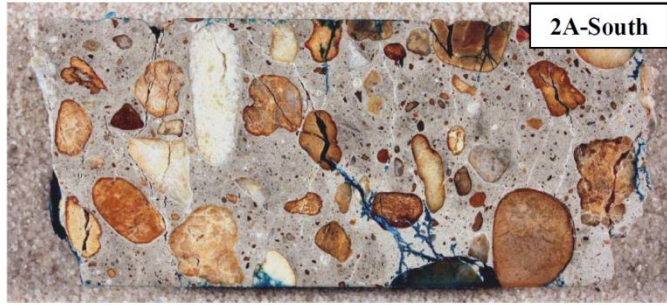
Polished concrete sections from the Gibb Graves Bridge, Wetumpka, Alabama.
